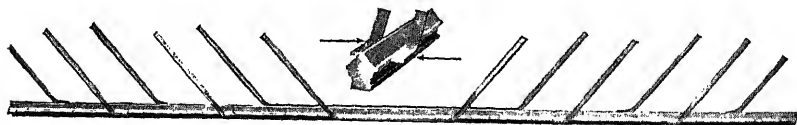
Kahn Trussed Bar for Reinforcement of Concrete
